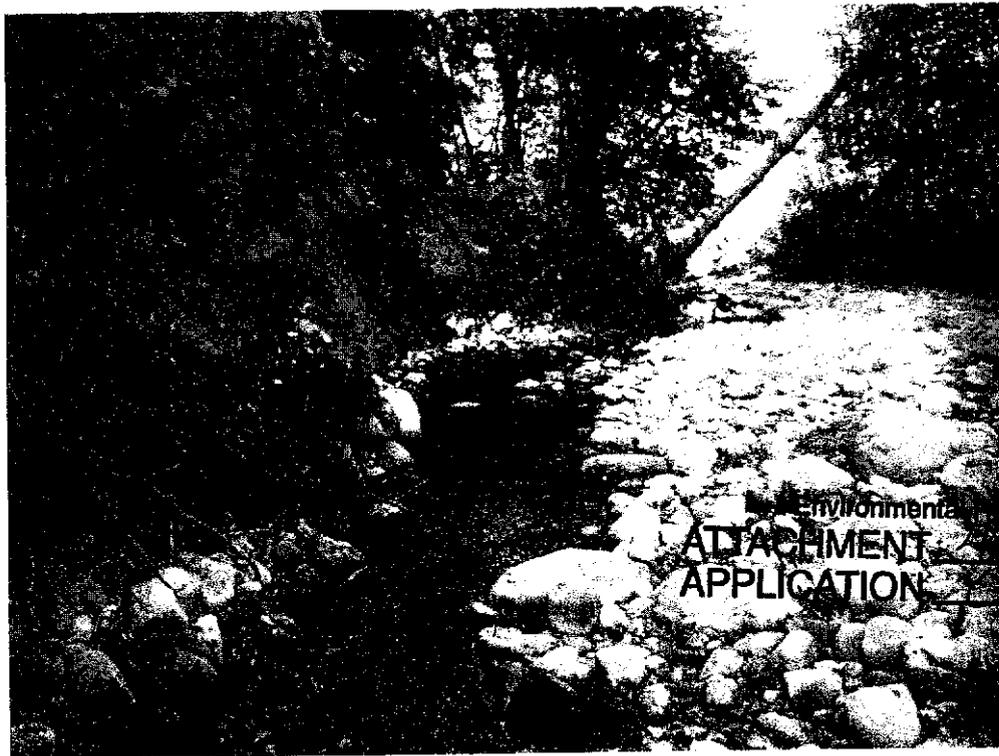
State Action Area. View of creekbank/roadway embankment failure from creekbed showing exposed alluvial substrate and road fill material.
